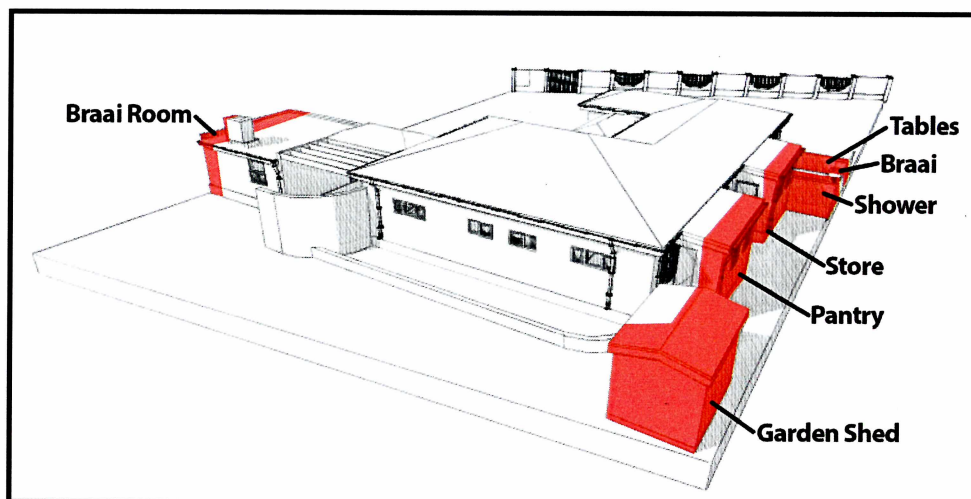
3D Image Illustrating Building Line Contraventions to be Legalised
